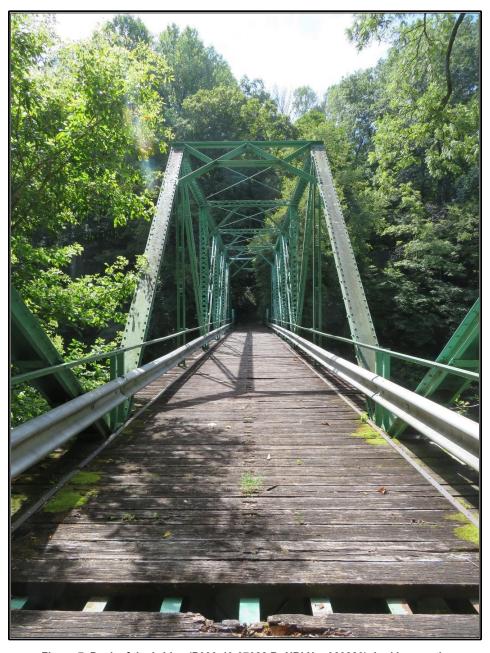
Deck of the bridge (P000-40-07088 B; NBI No. 060380), looking south.
